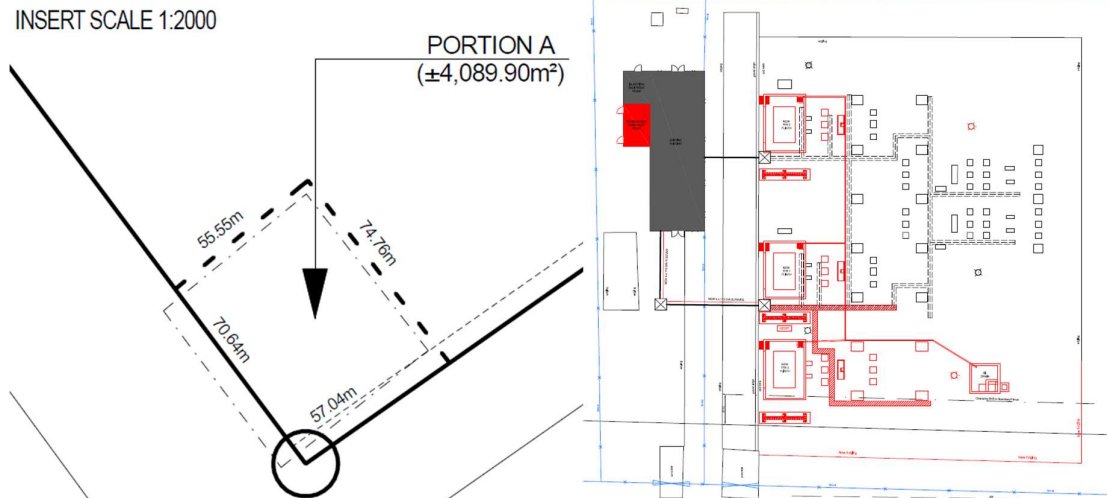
& 5: Subdivision Plan and Site Layout showing intended upgrades
